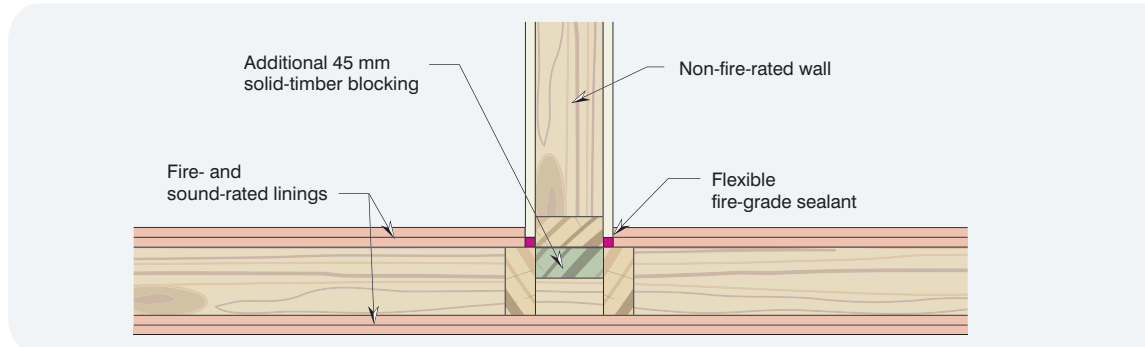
Non-rated wall abutting fire-rated wall using timber blocks – FRL 60 minutes – plan view.
